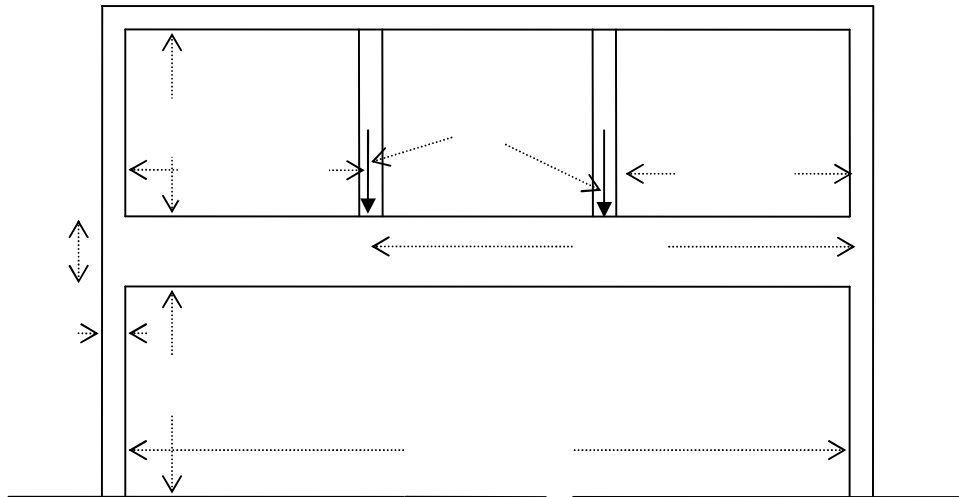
A commercial or industrial RC frame with open industrial space at ground floor and office on the first floor. The frame is repeated at 4m spacing designed with spandrel beams in between frames.
